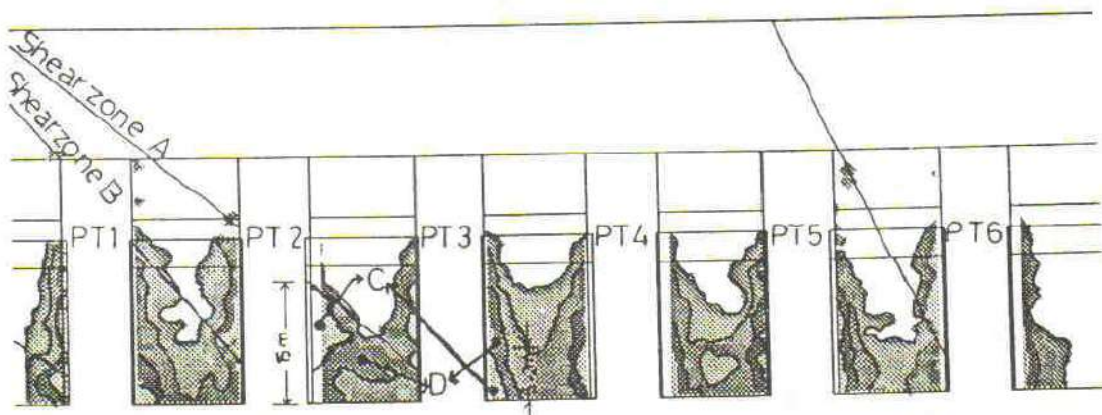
Tensile zones on upstream in plan section side at EL 6.5
